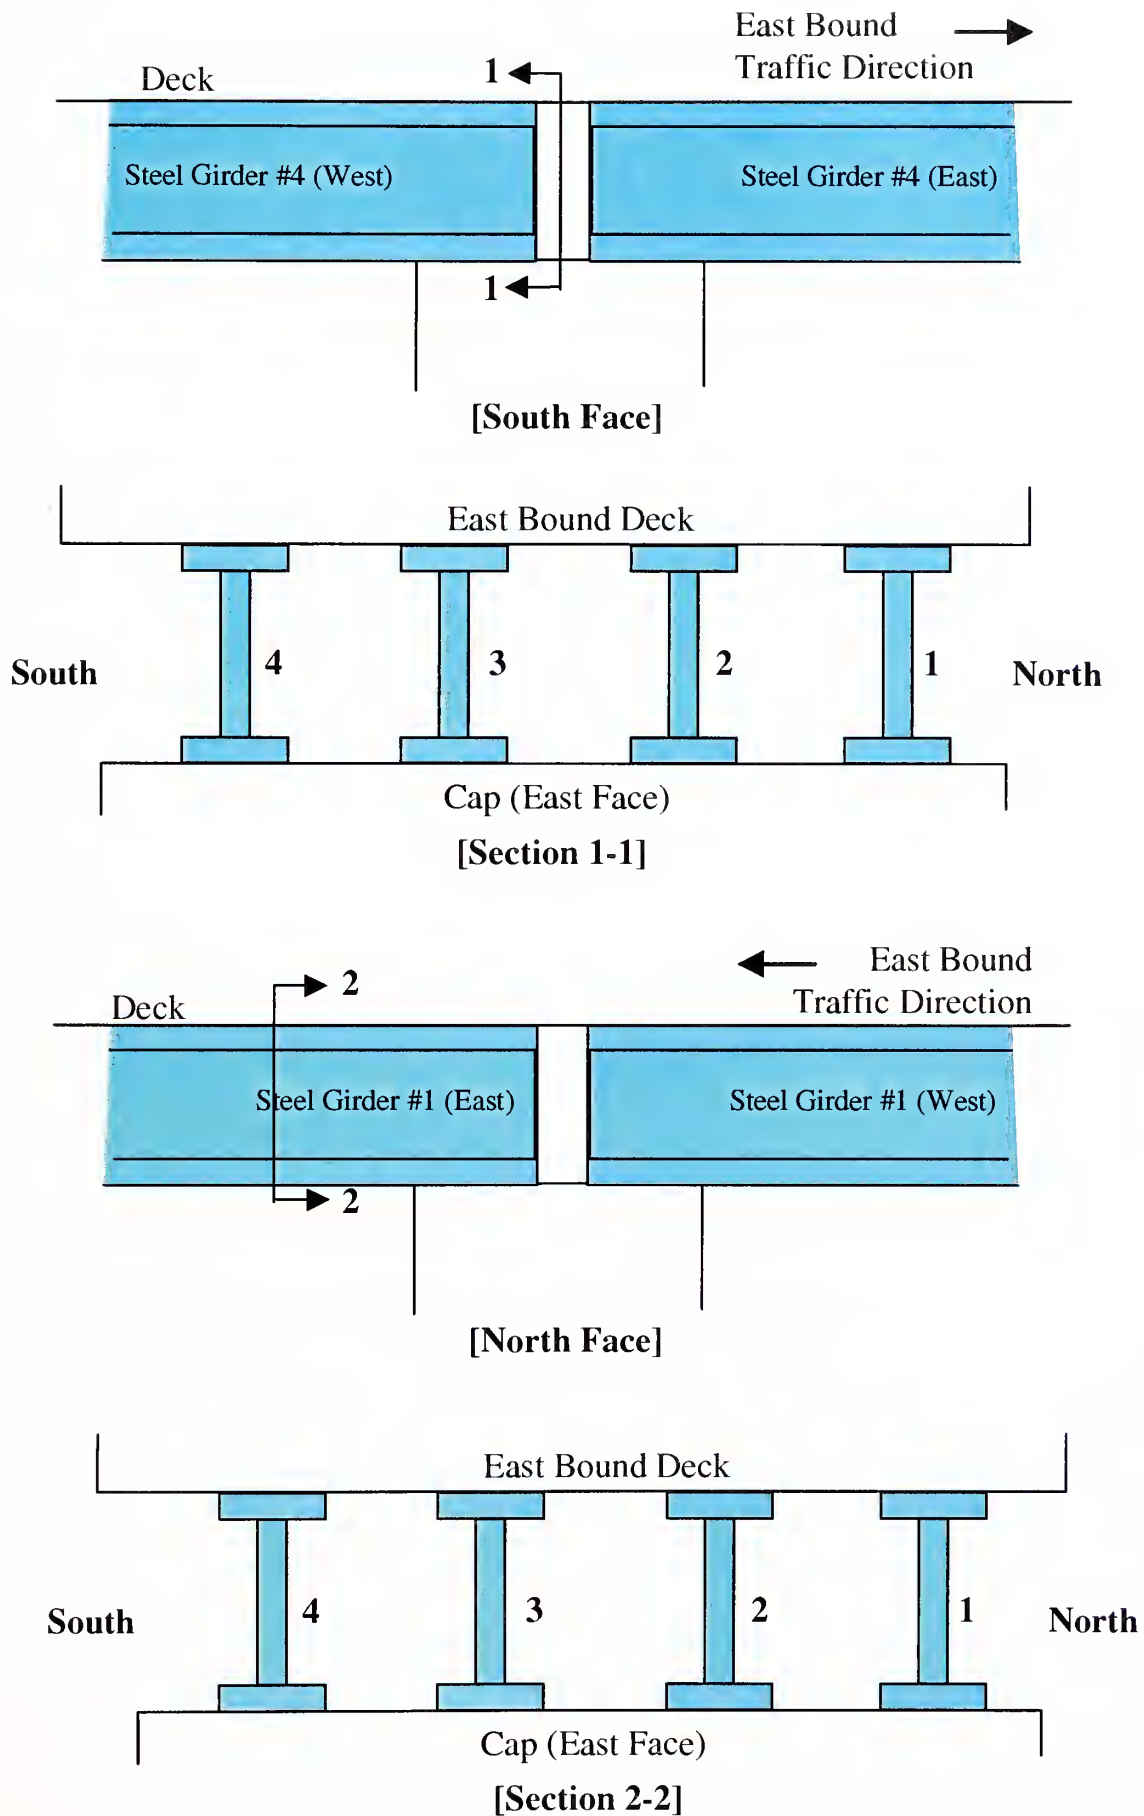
B. Condition of Girder Joints over Bent No. 9 (East Bound).
